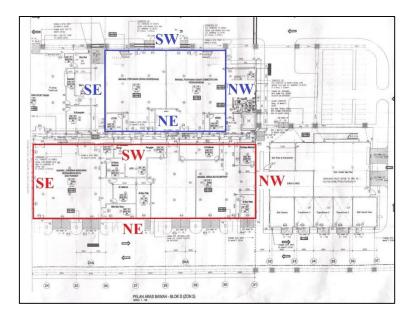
FPTV (Block D) - Right Side of Floor Plan Drawing (Ground Floor)
